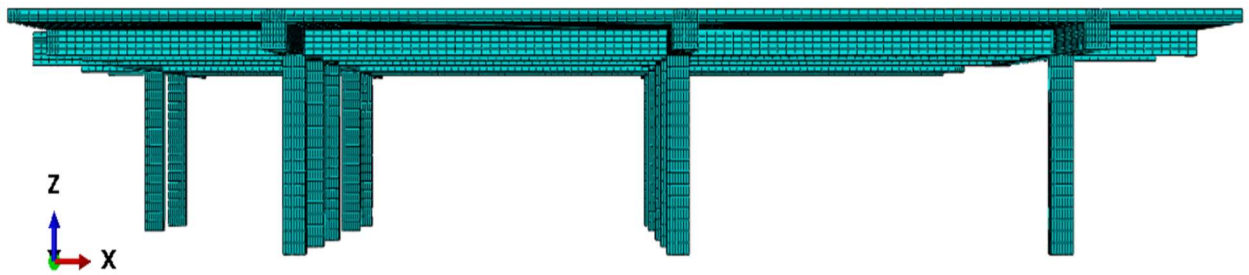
Display of the 3D quadratic cubic element mesh basements structural elements.
